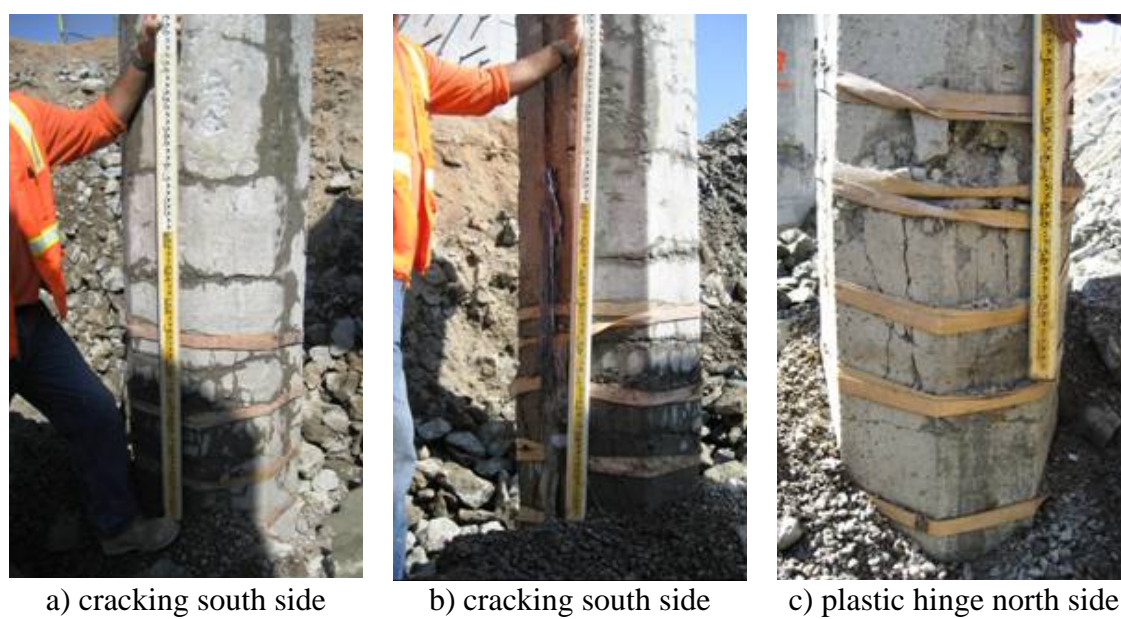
Pile inspection during demolition of the piles (System Test 1, P3)
